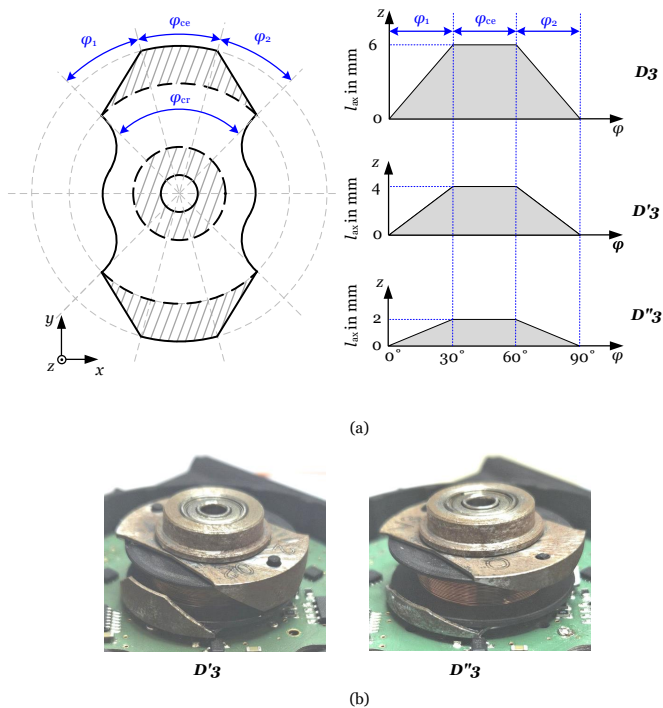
The claw-pole machine with trapezoidal claw,  $D_3$ , with different axial lengths of the claw: (a) drawings of the claw shapes and (b) prototypes.
